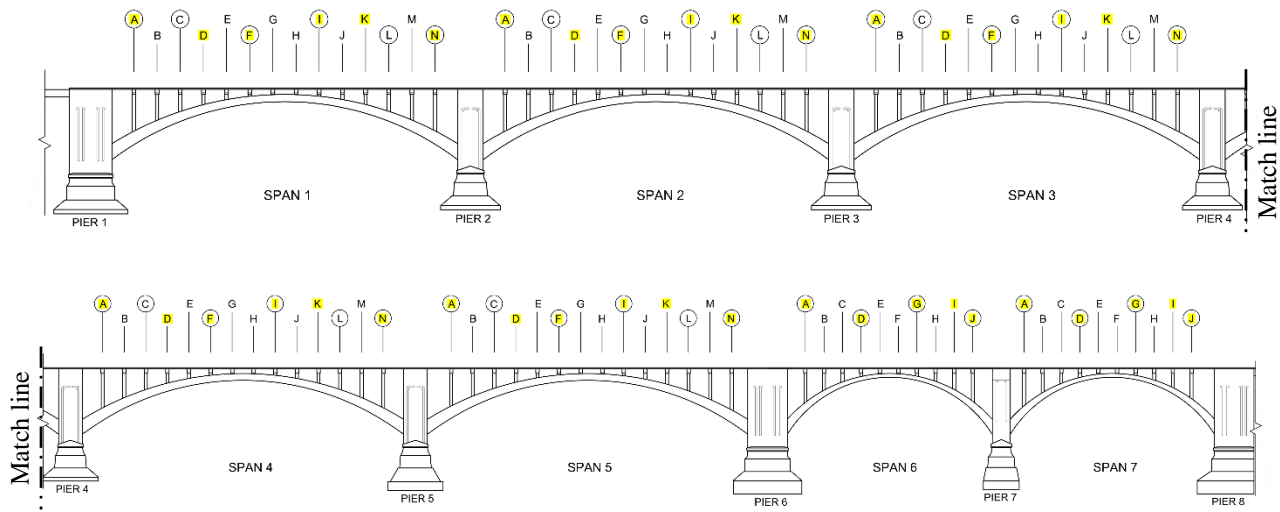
Elevation of bridge showing 1918 and 1980 deck joint locations. Column lines at original 1918 joints are circled; column lines at 1980 joints are highlighted in yellow.
